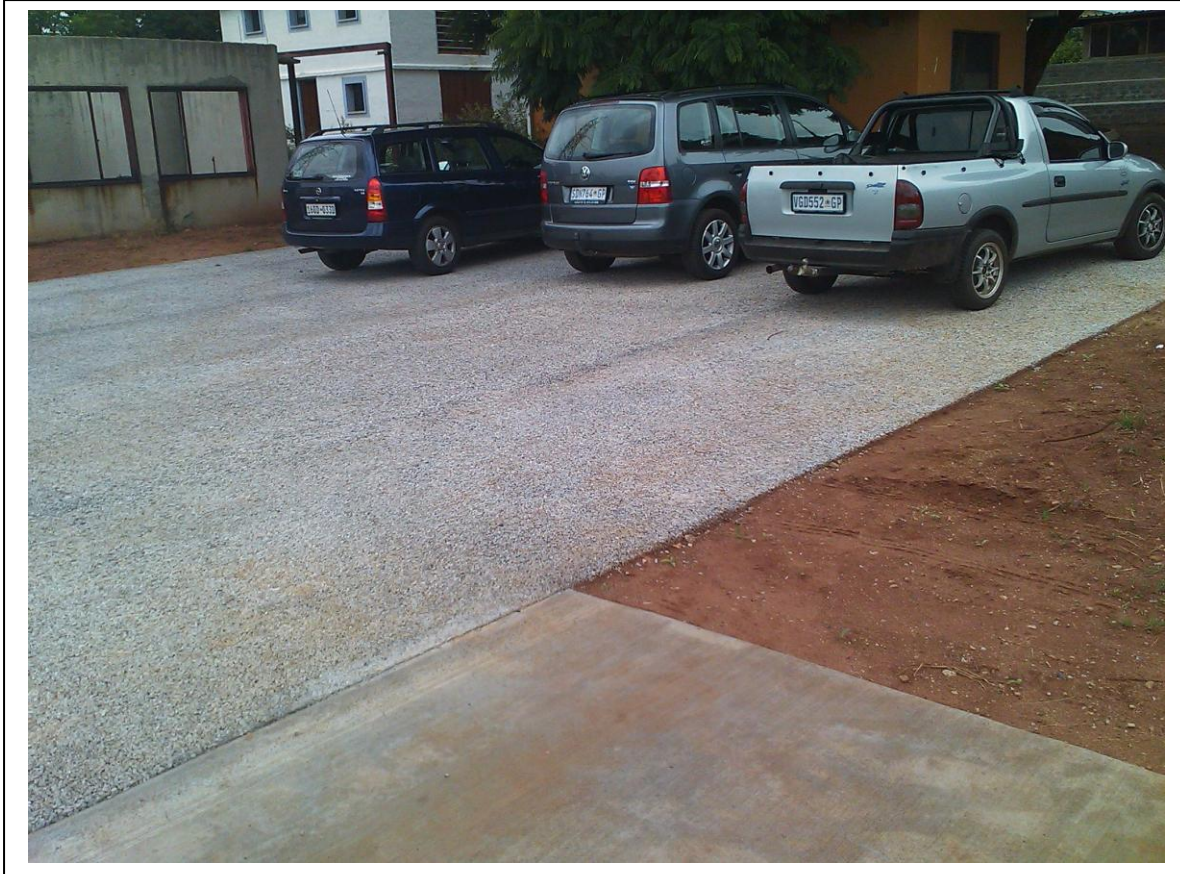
Porous Concrete Pavement, CSIR Innovation Site, Pretoria
